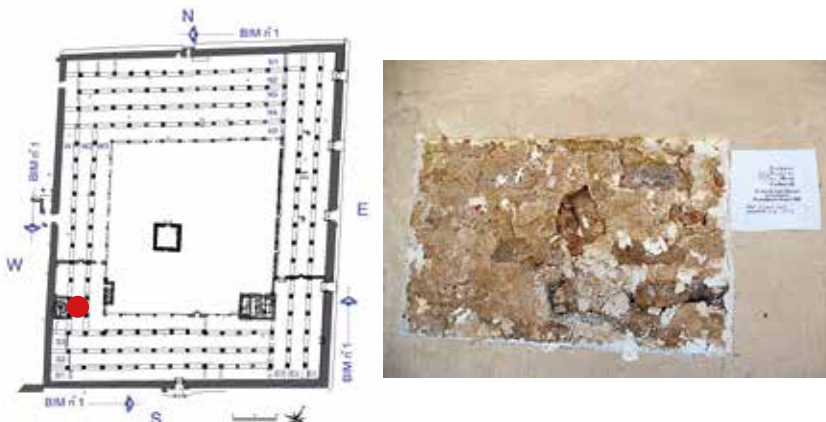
West minaret, east wall, sample no. MWEW0602.
